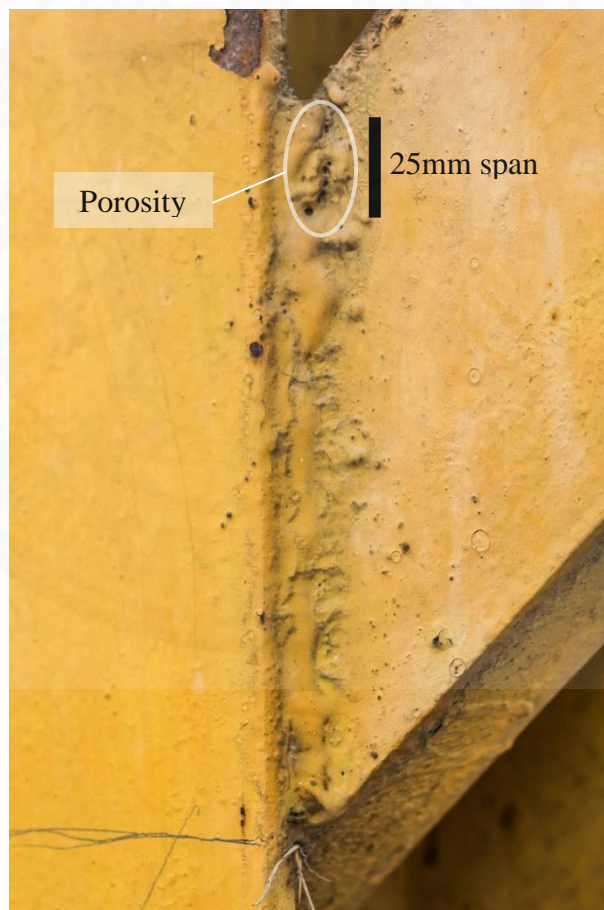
Welding defects on Billboard A (joint 1)
